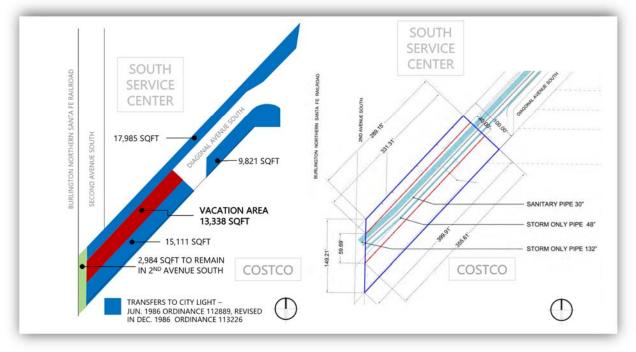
Vacation site details and dimensions. Underground utilities are shown.
